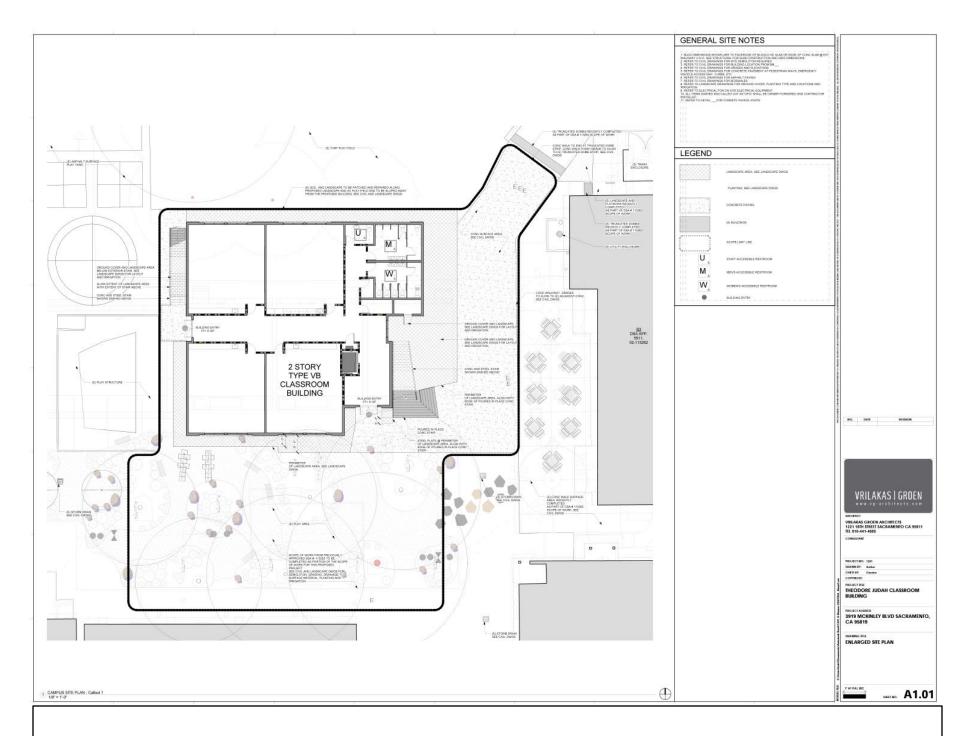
SITE PLAN OF PROPOSED CLASSROOM BUILDING
